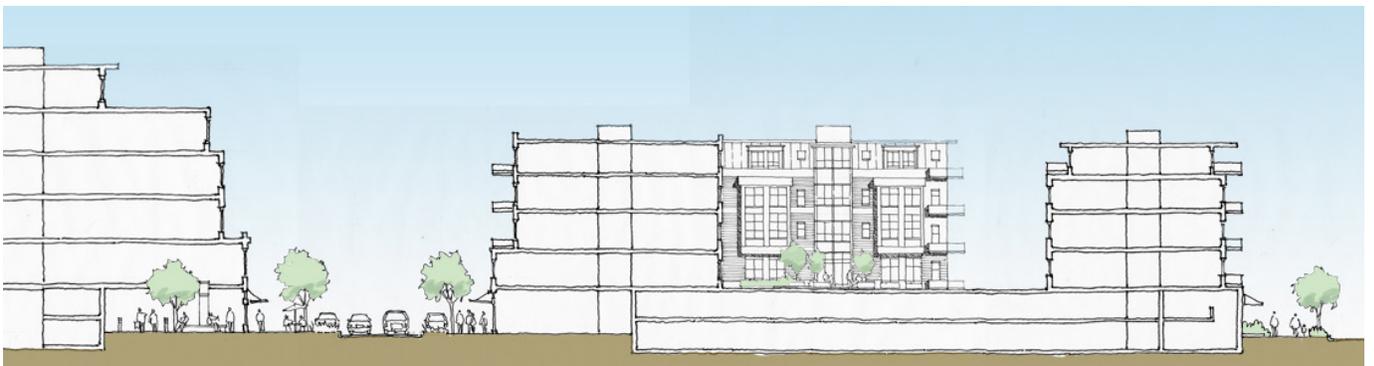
d.8 and 10: Parking within the building provides spaces to the interior of the site while ensuring active uses are along the street.
